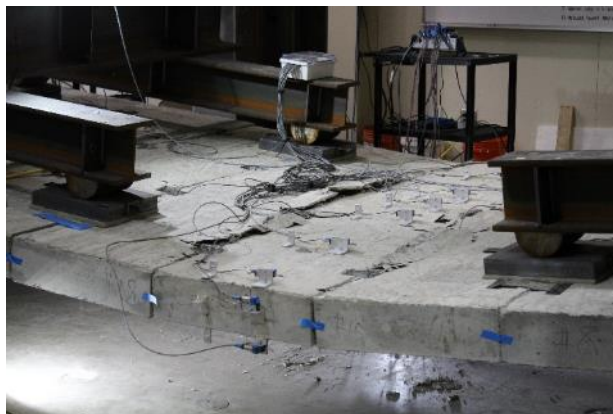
Concrete crushing at center section of Specimen 3-M20-3C-RL (after terminating the test)
